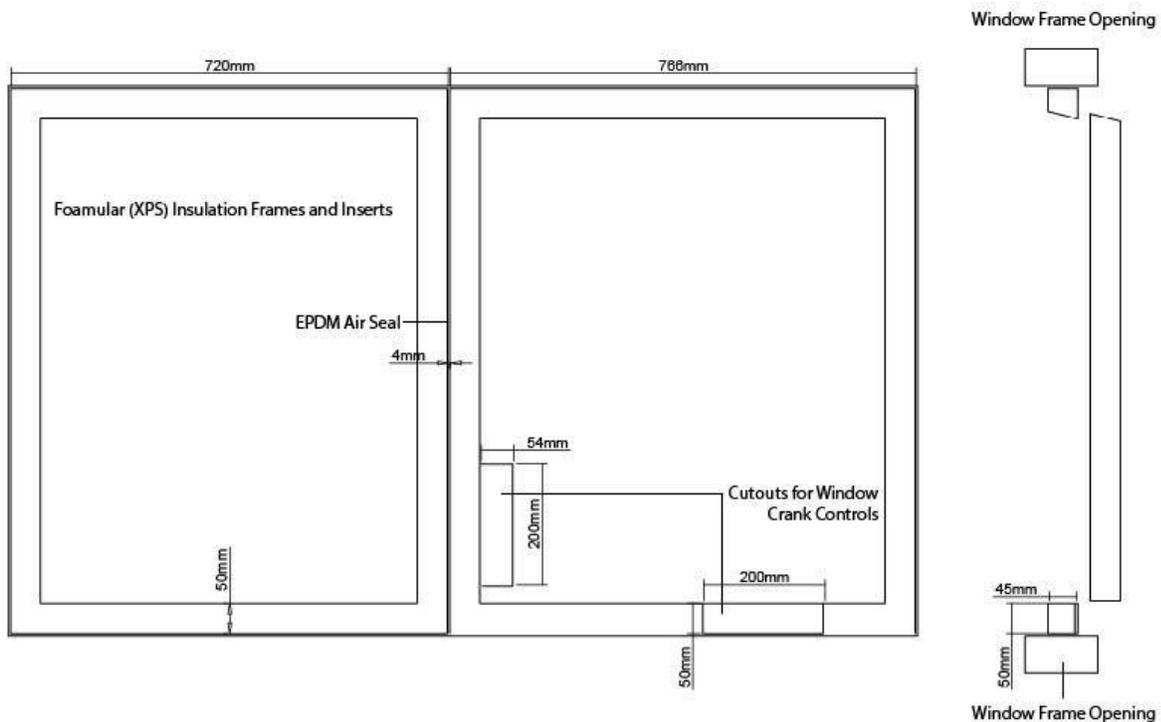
Design of the Experimental Static OI – Elevation and Section
